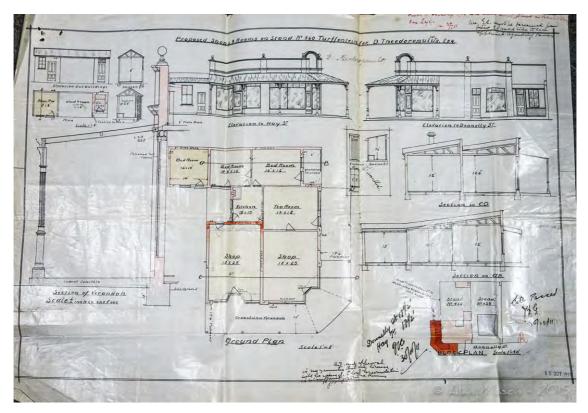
Original plans to Erf 460 showing proposed corner shop (Source: City Council of Johannesburg, Plans Archive)
